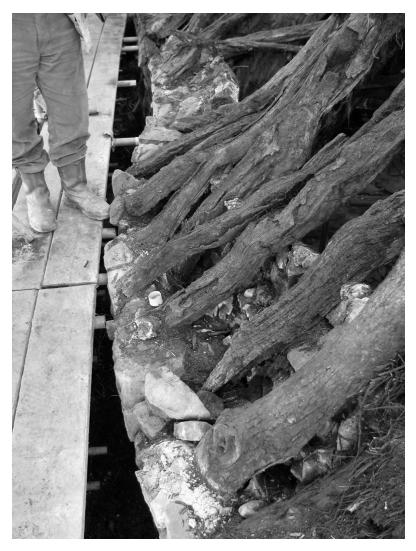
The south-west eaves wall showing effect of spreading trusses and rafters.
